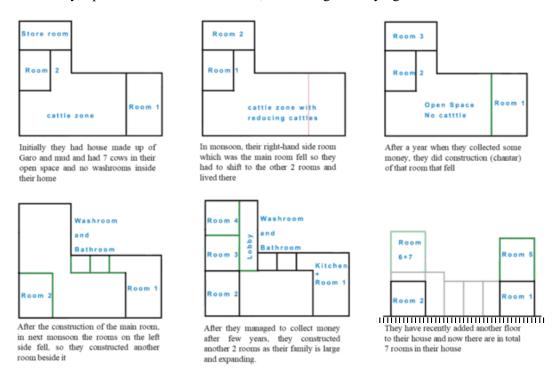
Plan that changes - Incremental use of the layout of the house Source: Author
